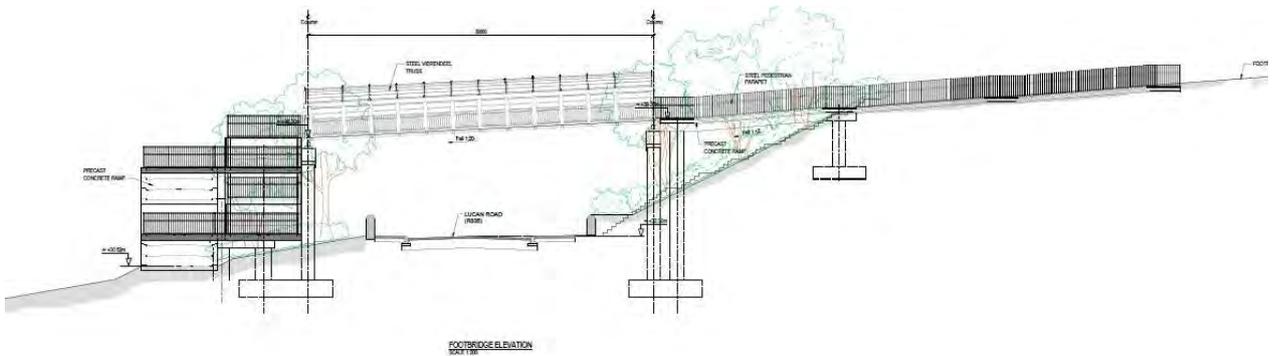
Elevation of Bridge Crossing for Route 4-2
